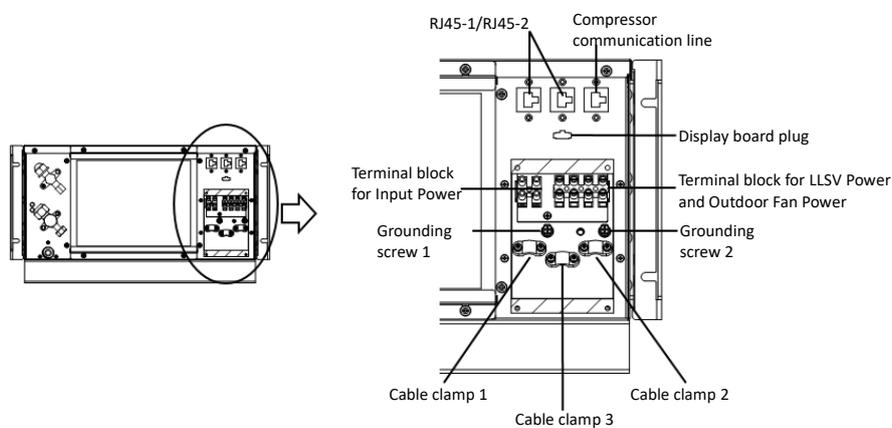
Input Cabling Connections – Indoor Power Terminal
